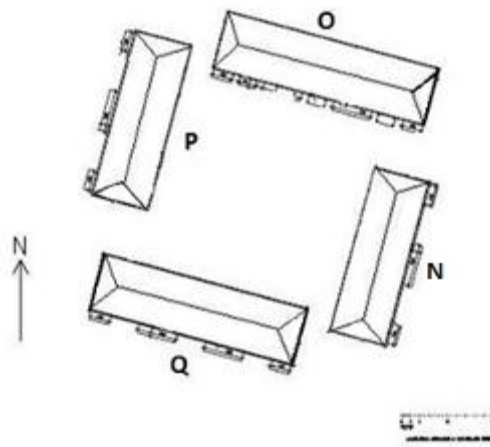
Situation plan over the four buildings N, O, P and Q in Brogård
